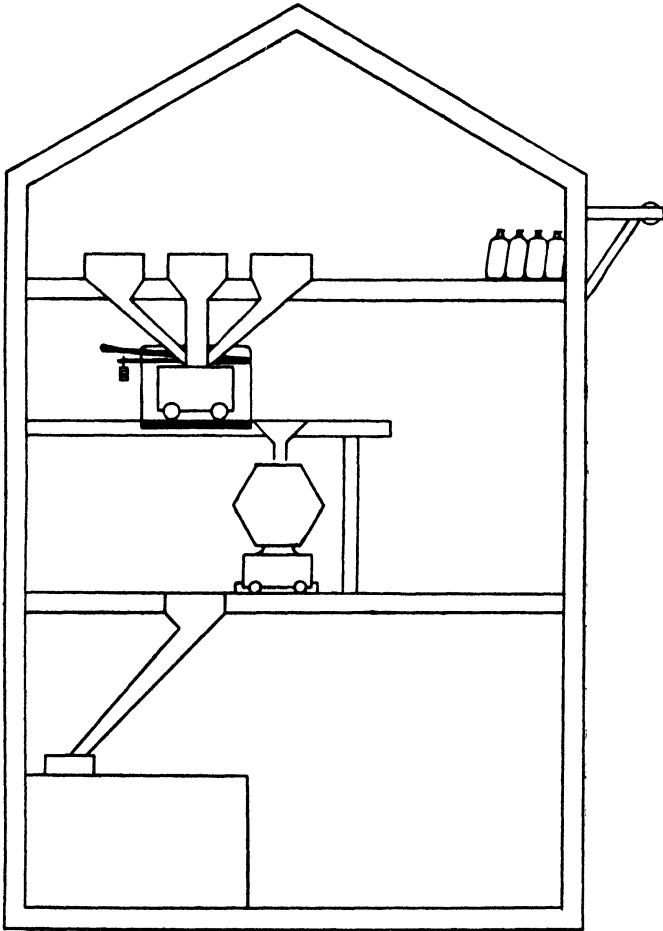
Elevation of Suggested Building for Enamel-Preparing Department.
